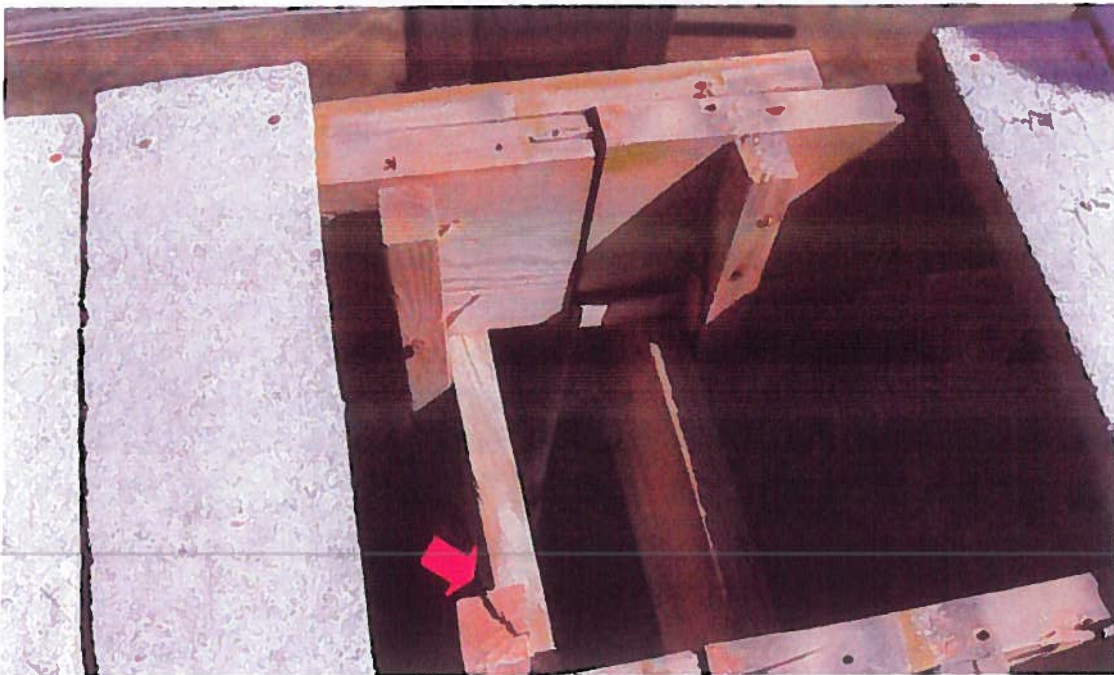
Under-deck framing showing splitting of lumber ties and stringer joist splice. Deck members showing signs of moderate to advanced degradation.
